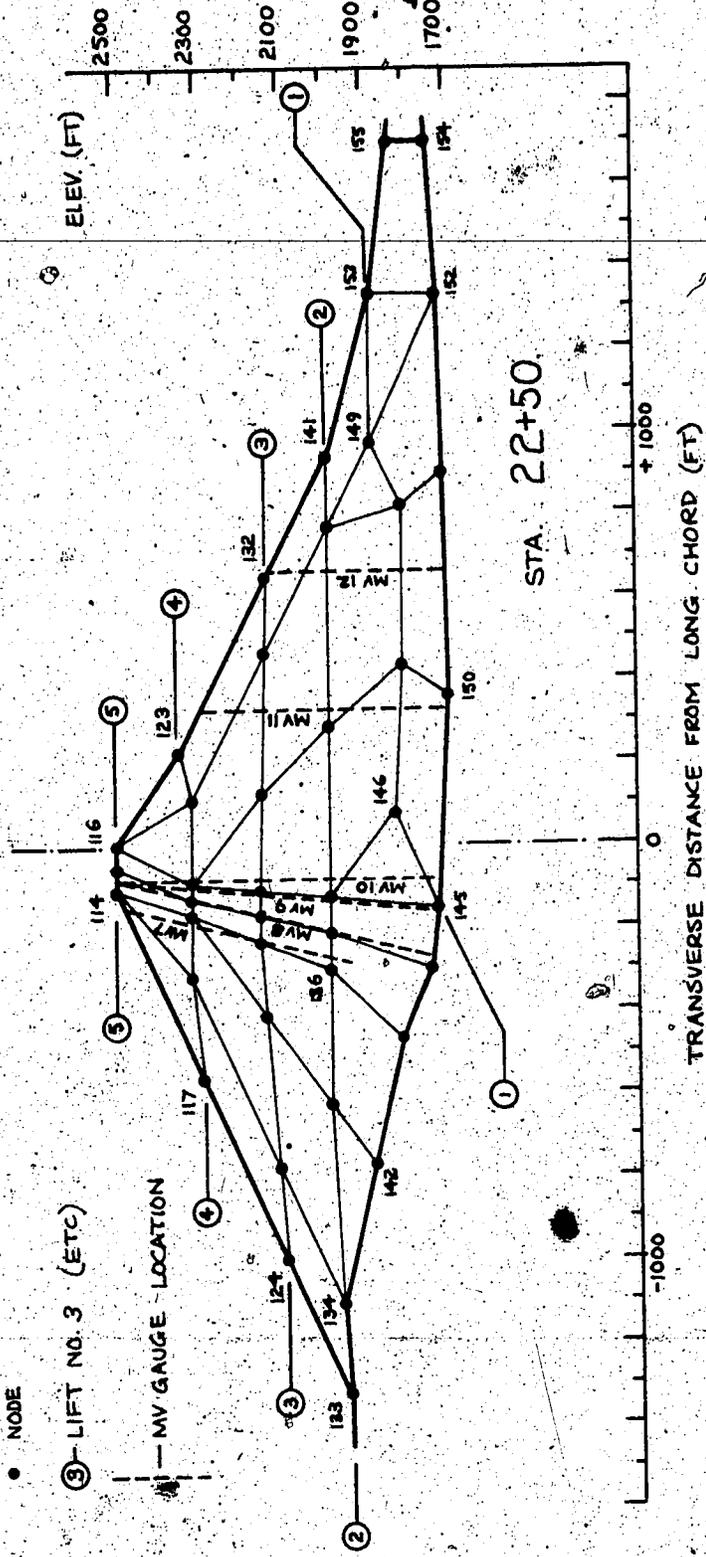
TRANSVERSE SECTION, STA. 22+50:
